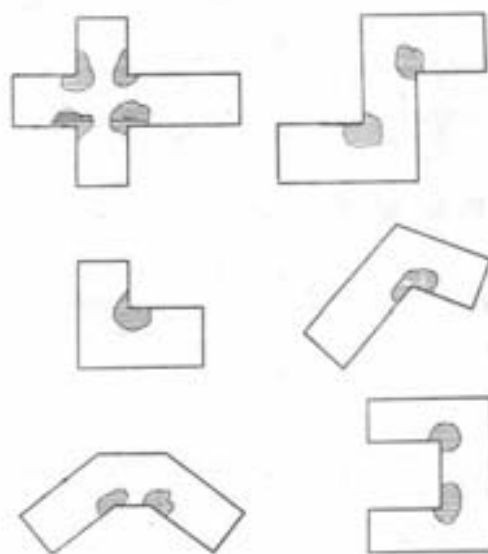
Places of damage of buildings with complex plans during earth quakes.
